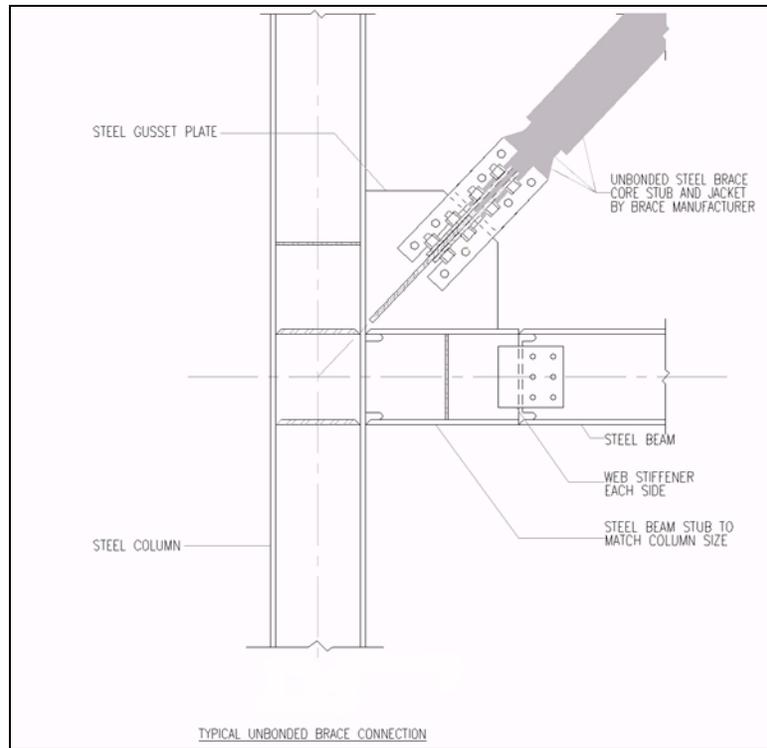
Typical Detail for Unbonded Braced Frame Connection.
